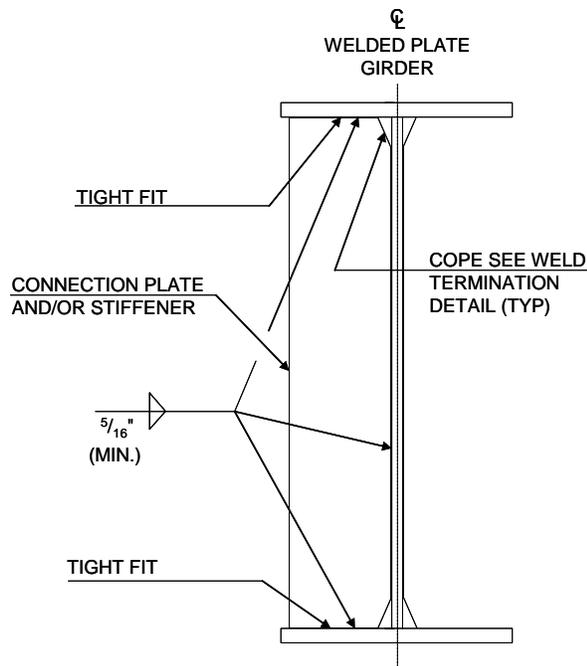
5 Intermediate connection plates and/or stiffeners for welded plate girders
